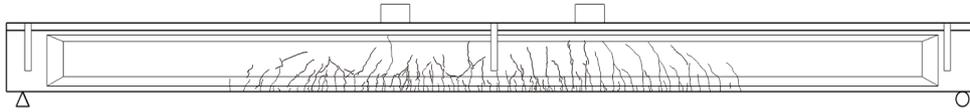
Crack pattern of Guro Overpass (when termination)
